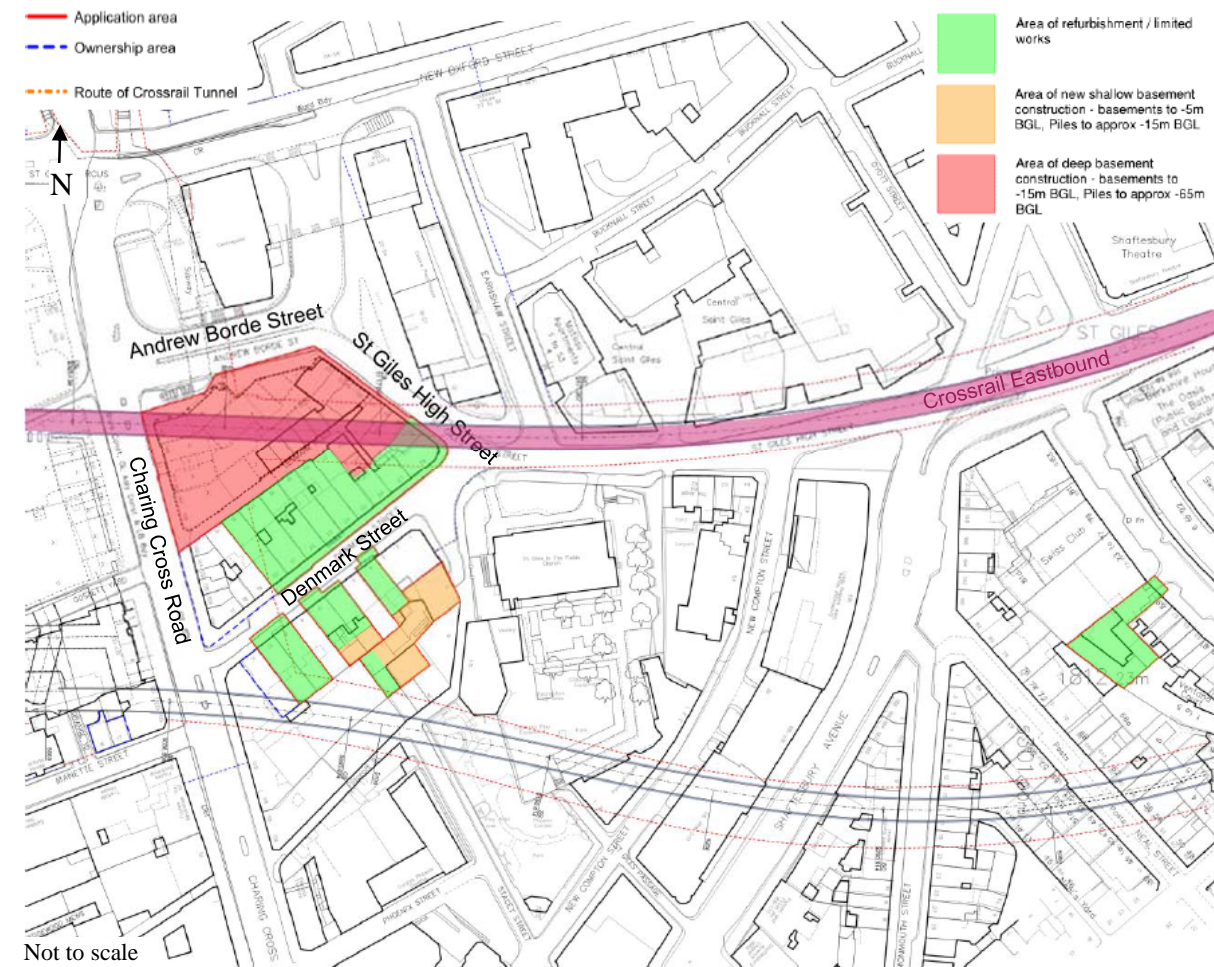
Site plan (extract from Engenuiti Crossrail Ground Movement Impact Assessment).
